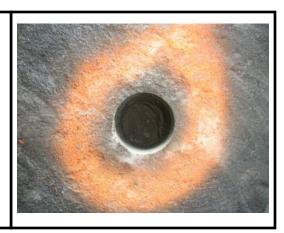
Facing North Project Site Third Addition Soil Sample 22 Hydraulic Probing Typical
